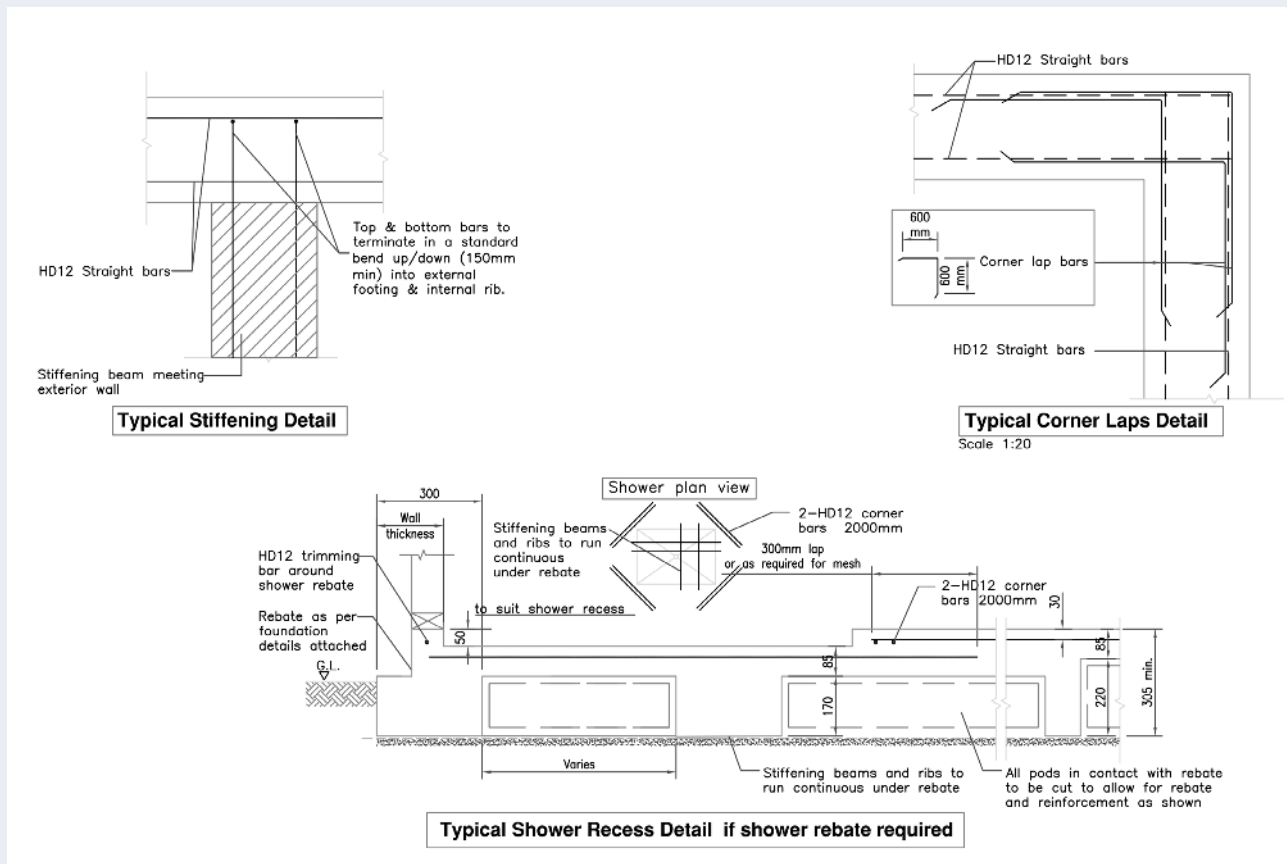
Typical shower rebate details and corner bar lap detail
